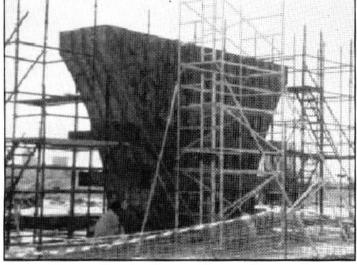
Typical View of Pier Formwork supplied by M/s Anvem
